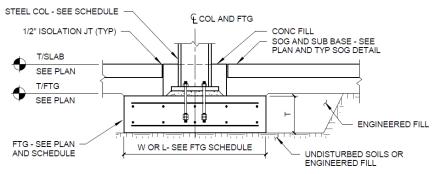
Typical Column Footing without Pier (Sheet S-3.01, Detail 2)
